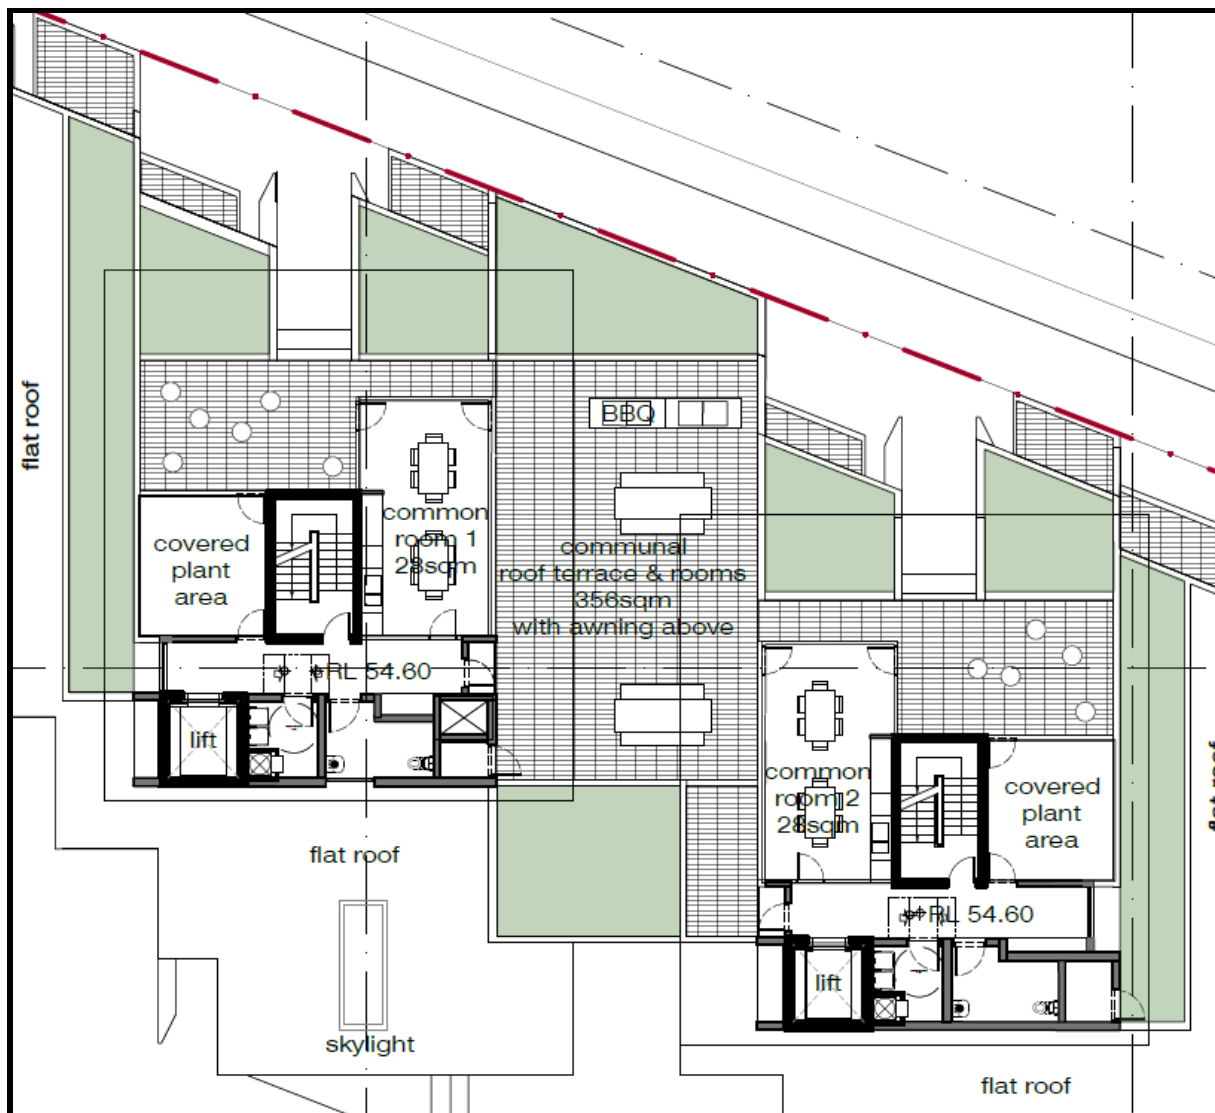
Roof top area - Building 2 (Source: Marchese Partners, August 2020) Loss of Privacy
